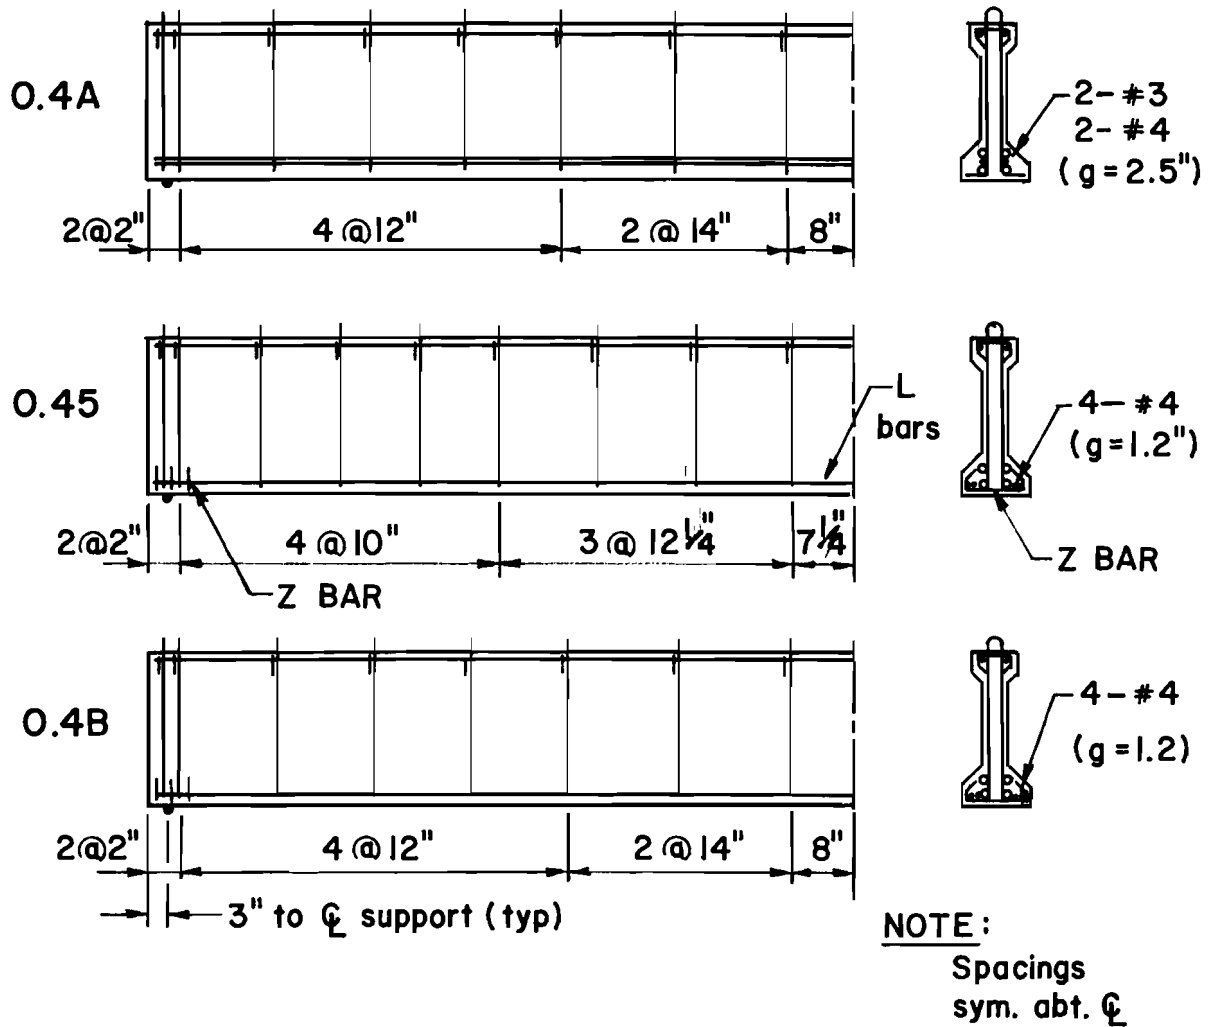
Details of the nonprestressed longitudinal and transverse reinforcements
